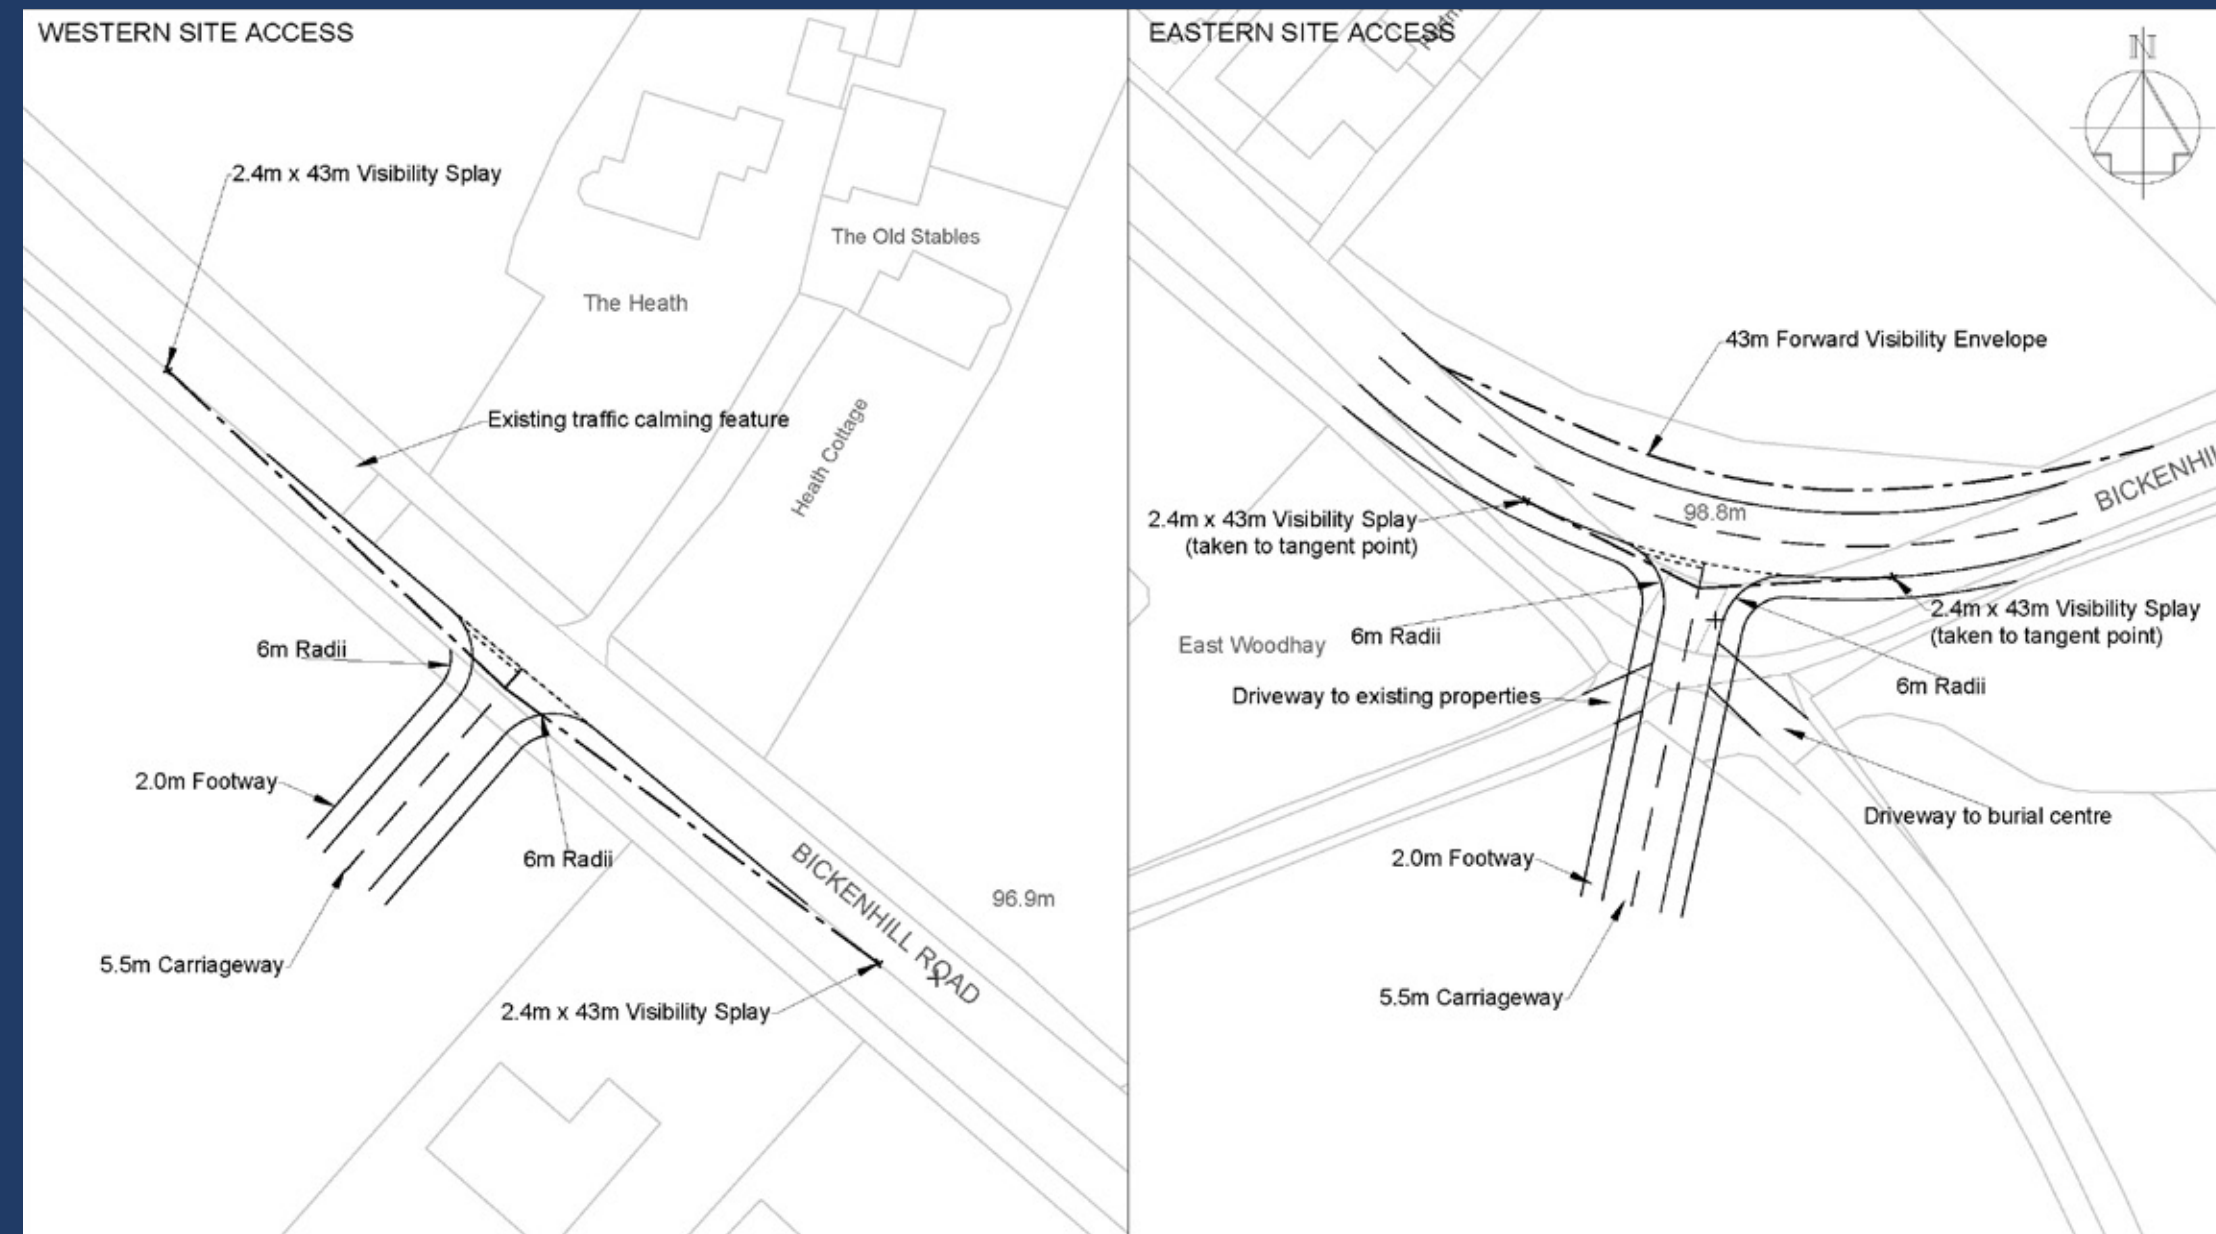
| POTENTIAL PROPOSED ACCESS | NOT TO SCALE
